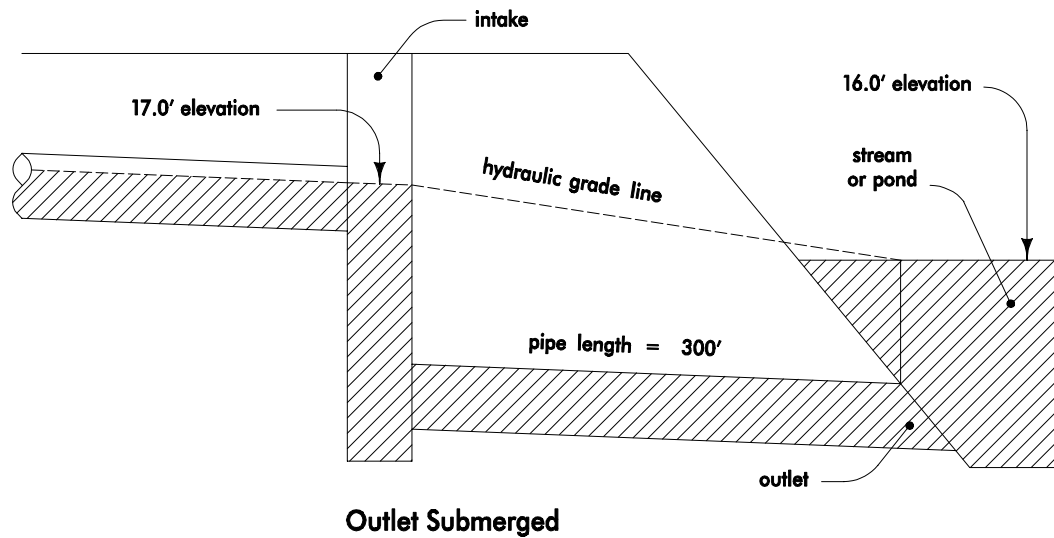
Storm sewer pipe with outlet submerged (Sample Problem 2).
